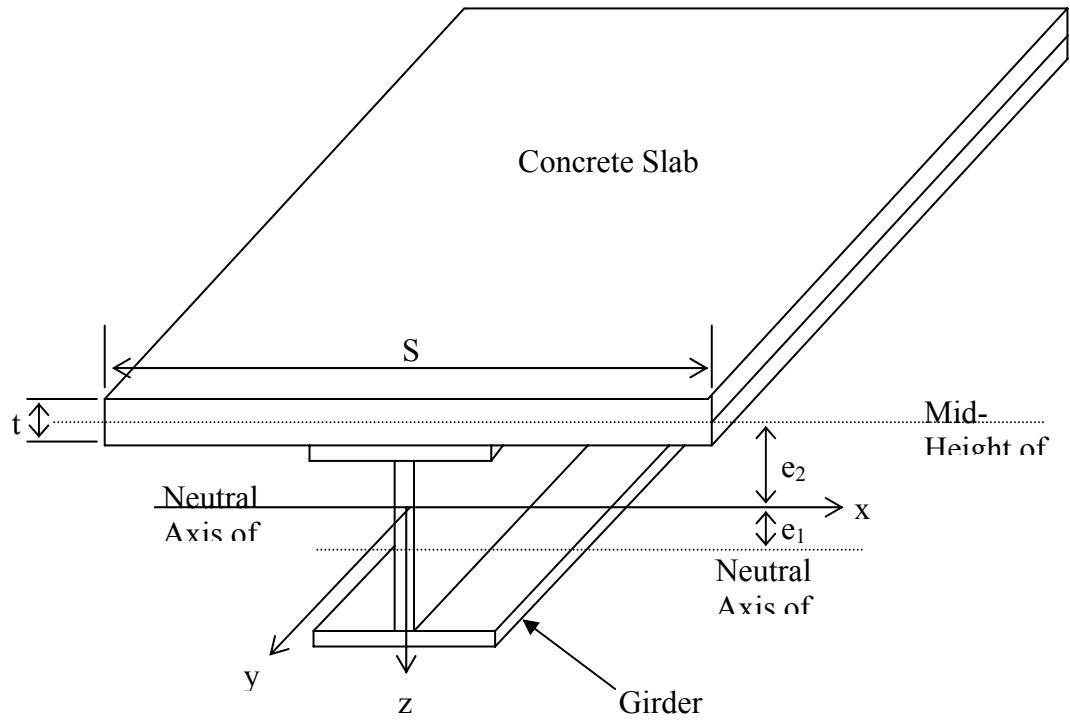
T-Beam Section of Deck (Cao and Shing 1999)
